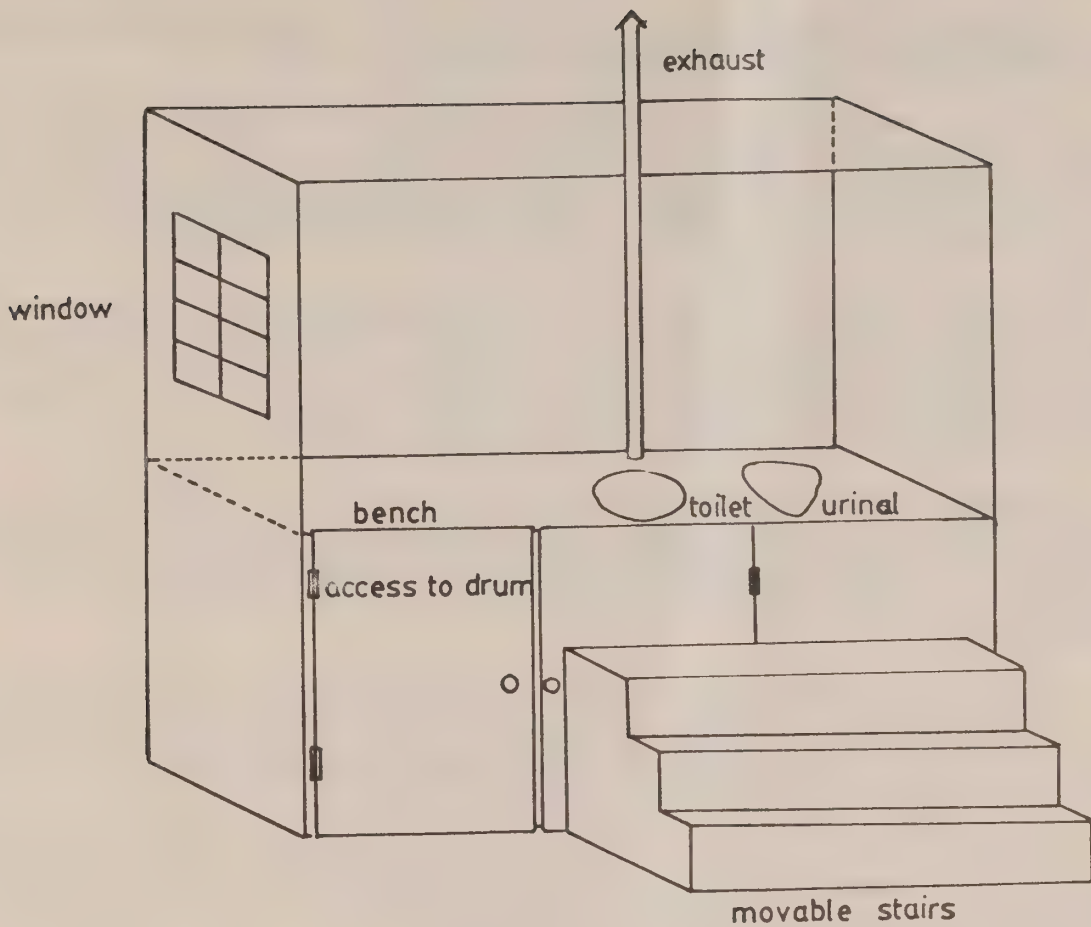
Interior view of toilet room. Both privy drums sit on top of the floor and must be removed from inside this room. The toilet seat is about 1 1/2 feet above the upper stair.
